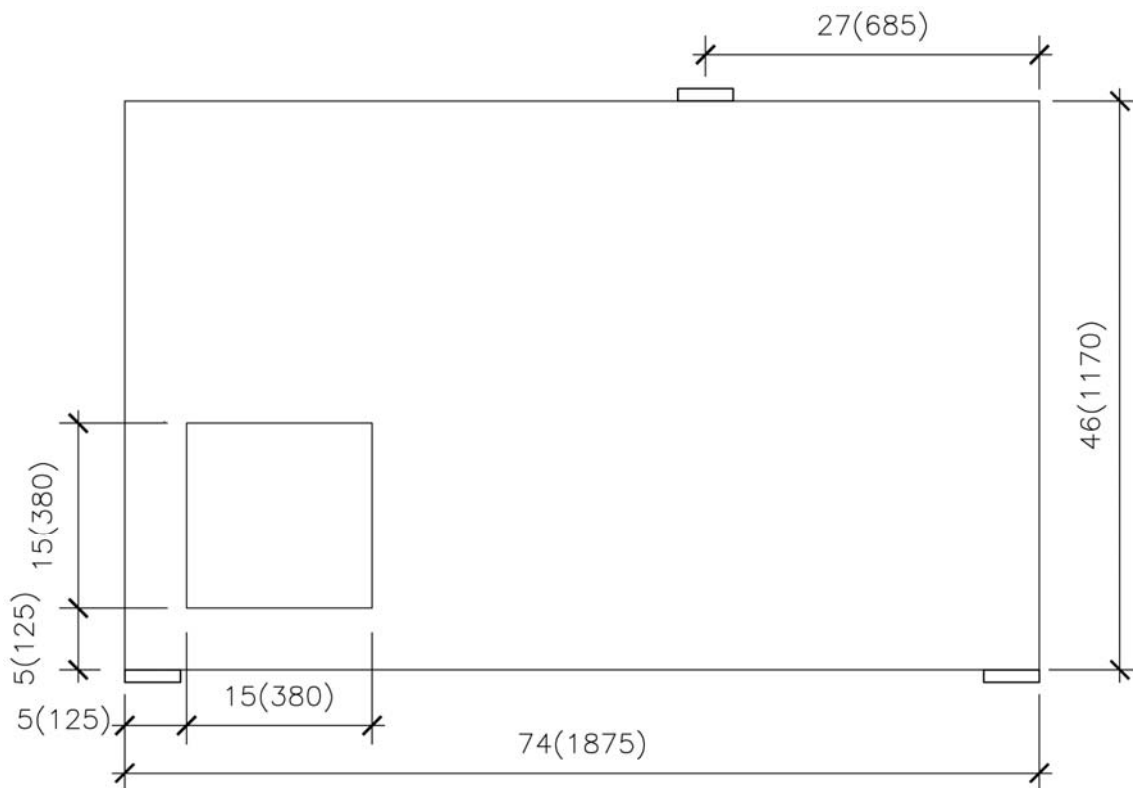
Geometry of beam with opening. Units in inches and (mm)
